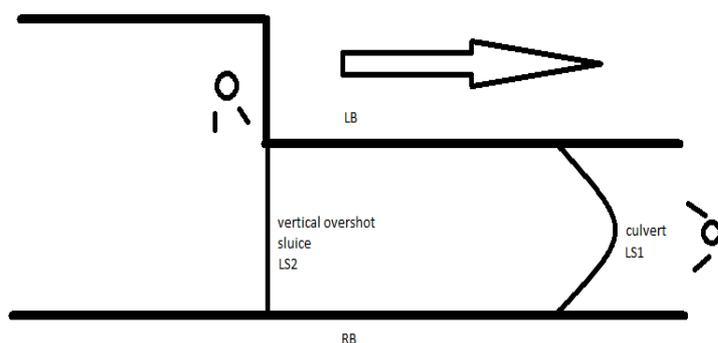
Site plan for Brazil Mill Woods Barrier 1
